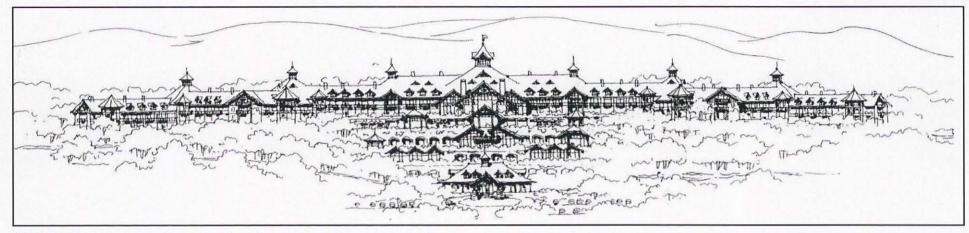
Architectural elevation of the Wildacres Resort (north elevation).
